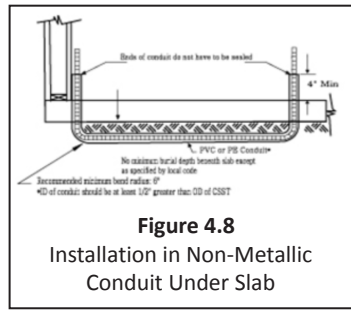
Installation in Non-Metallic Conduit Under Slab
